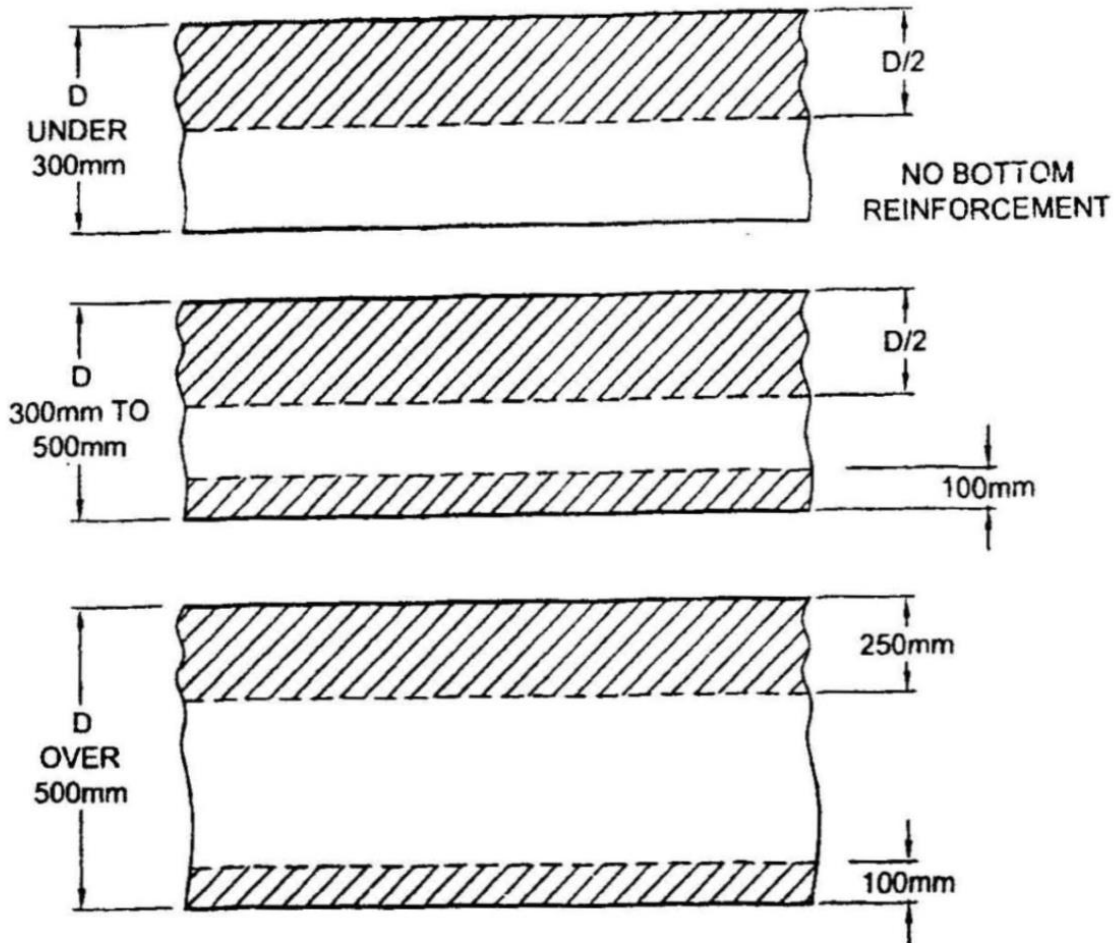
FIG. SURFACE ZONES: WALLS AND SUSPENDED SLABS
